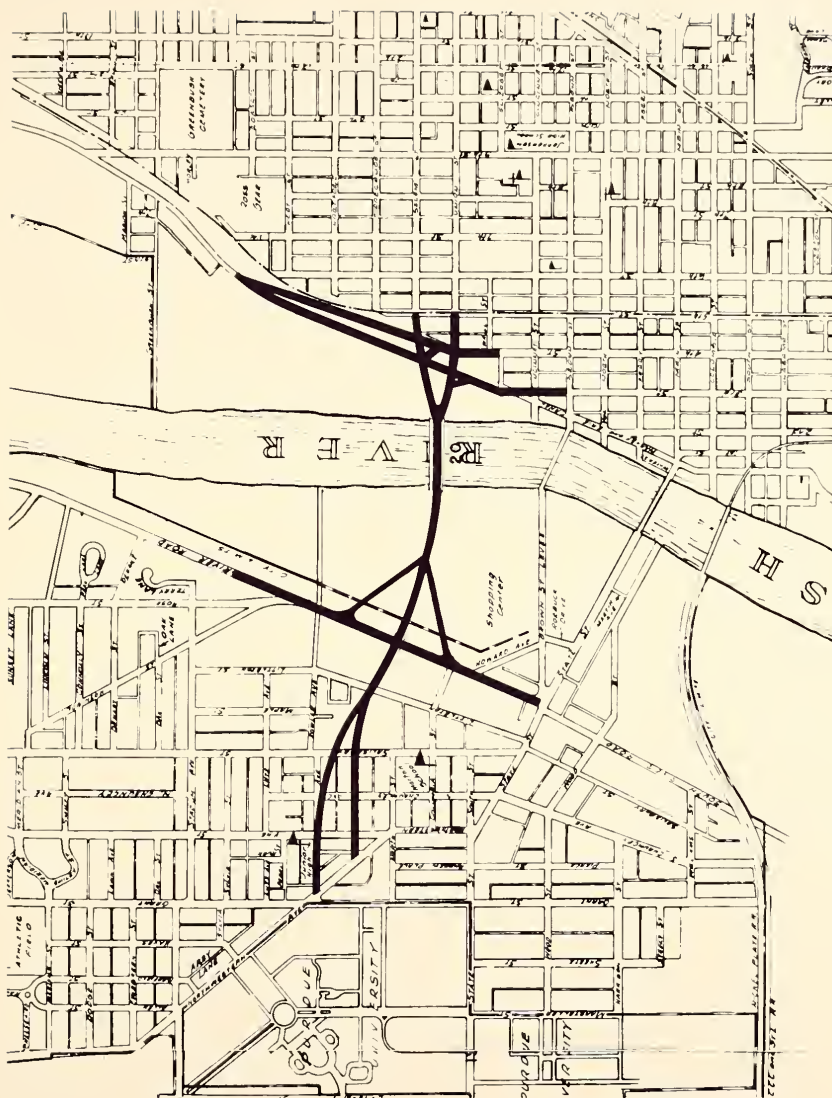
LIMITS OF CONSTRUCTION FOR HARRISON BRIDGE
